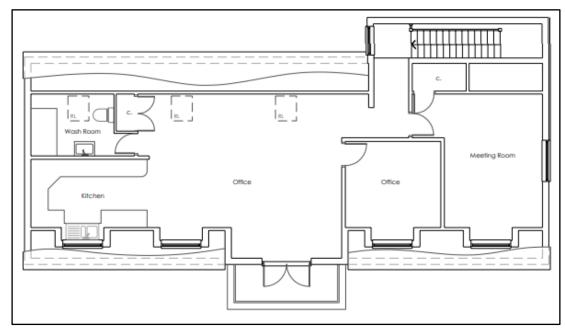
GARAGE BUILDING FIRST FLOOR PLAN (KENT BUILDING COTNROL)
